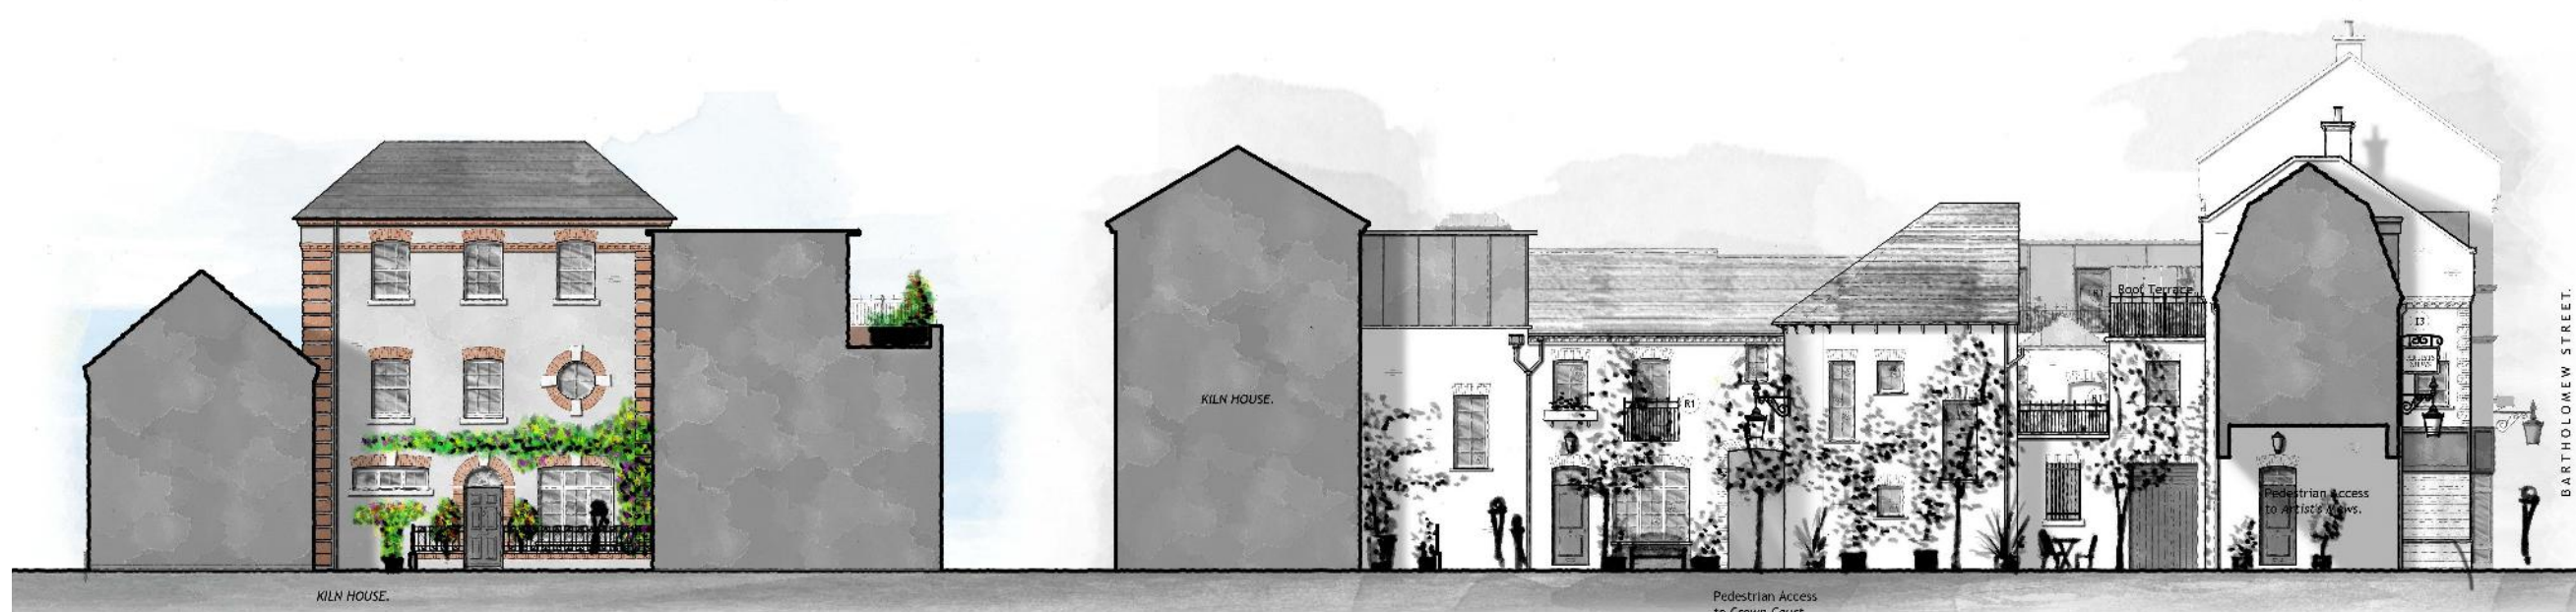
Artist's Mews (North) Elevation (Kiln House).
